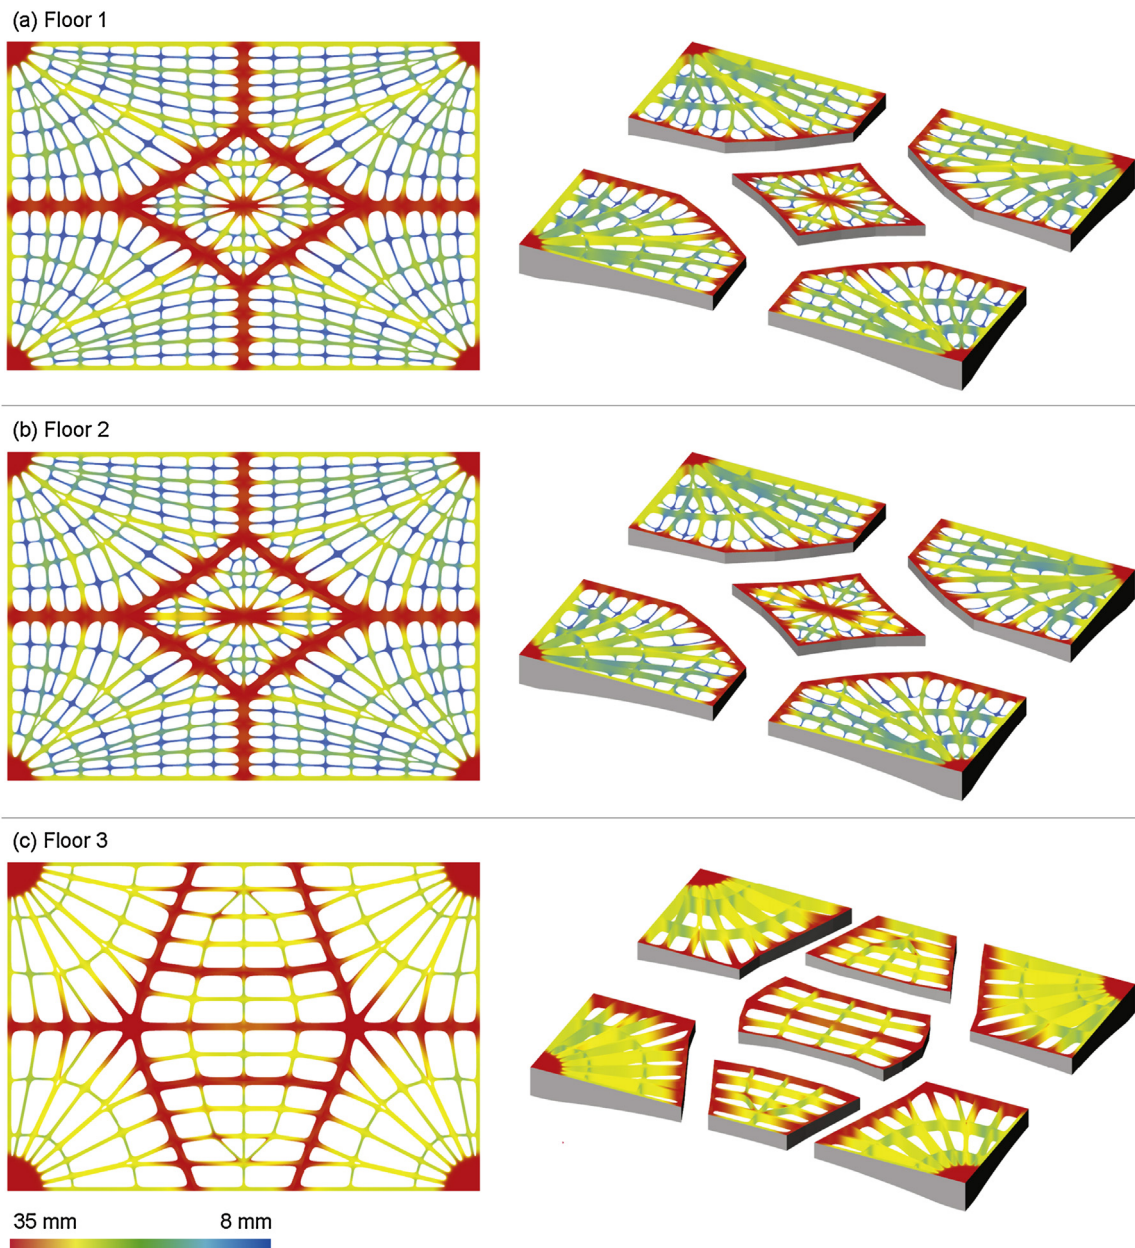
Rib pattern geometries and discretisation layouts for (a) floor 1, (b) floor 2 and (c) floor 3. Differences between the floors include (a, b) local rib thicknesses (c) discretisation layouts.
